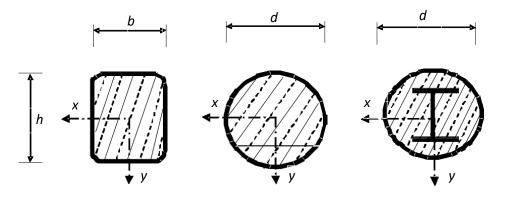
Typical Cross-Sections of Concrete Filled Tubular Sections
